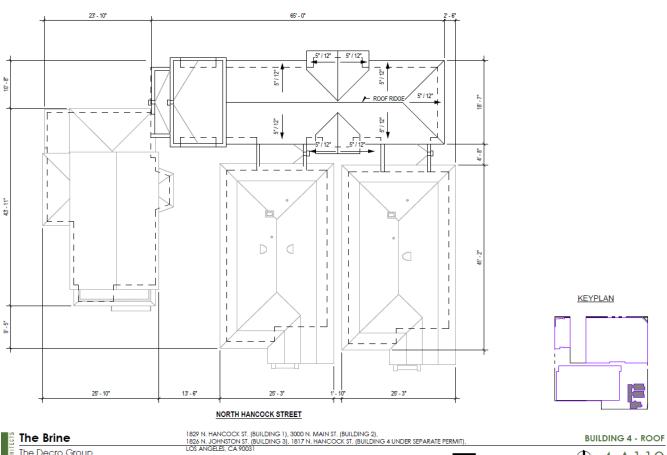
Schematic/Design Development, TSM Architects; Roof Plan February 2020
